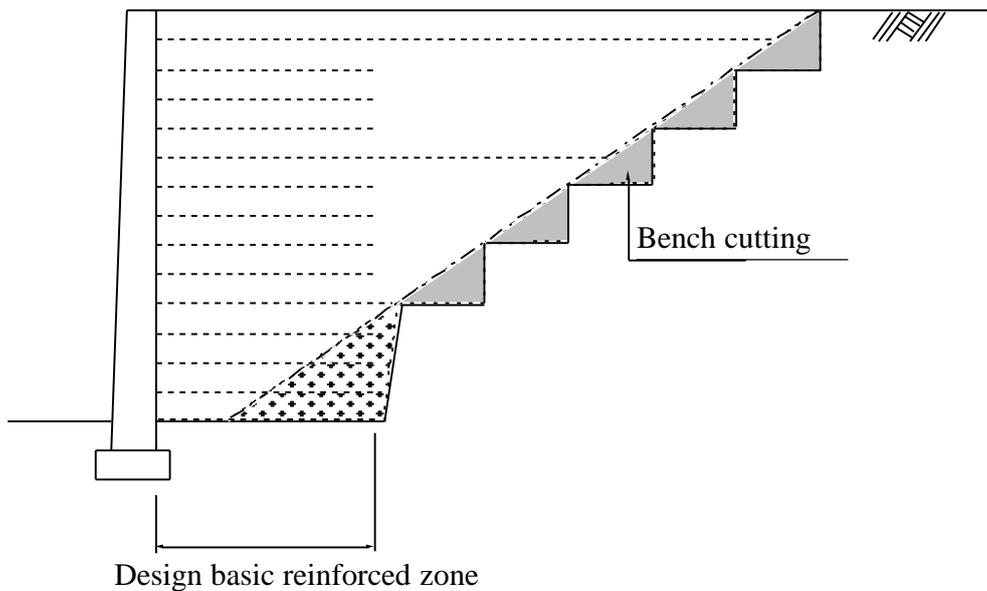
Bench-cutting of existing embankment slope surface
